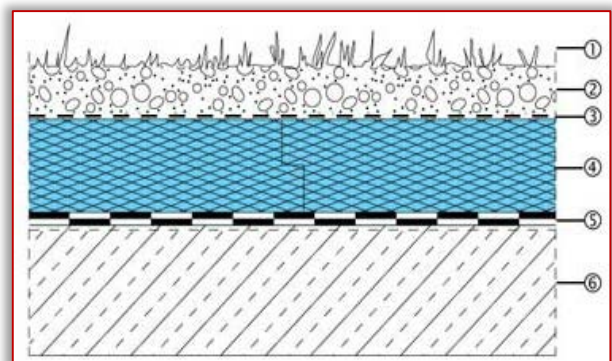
Single-layer extensive green roof: 1) extensive lawn - vegetation; 2) drainage vegetation layer 80-100 mm thick; 3) fabric (e.g. polypropylene) 110-140 g/m²; 4) insulation material; 5) bituminous waterproofing sheet; 6) concrete ceiling
